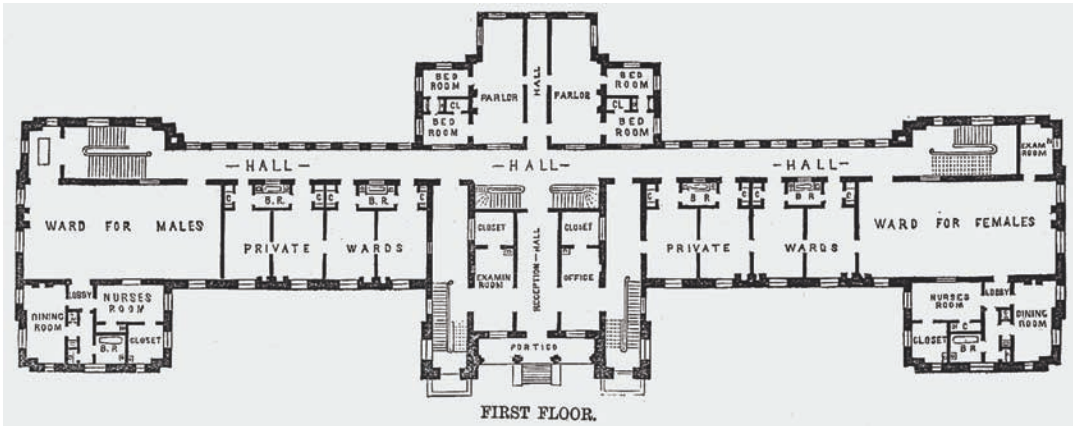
Saint Luke's Hospital, New York City, first-floor plan, 1860. The varying ward sizes—private rooms (with private bathrooms) and small wards on the first floor and large wards on the upper floor—provided a range of spaces to correspond with the ability of the patients to pay for all or part of their stay. This plan also reveals the two kinds of examining room—one immediately off the ward to provide privacy and one off the main entrance to accommodate the interviews and diagnostic exams necessary for applicants to prove worthiness for admission.
